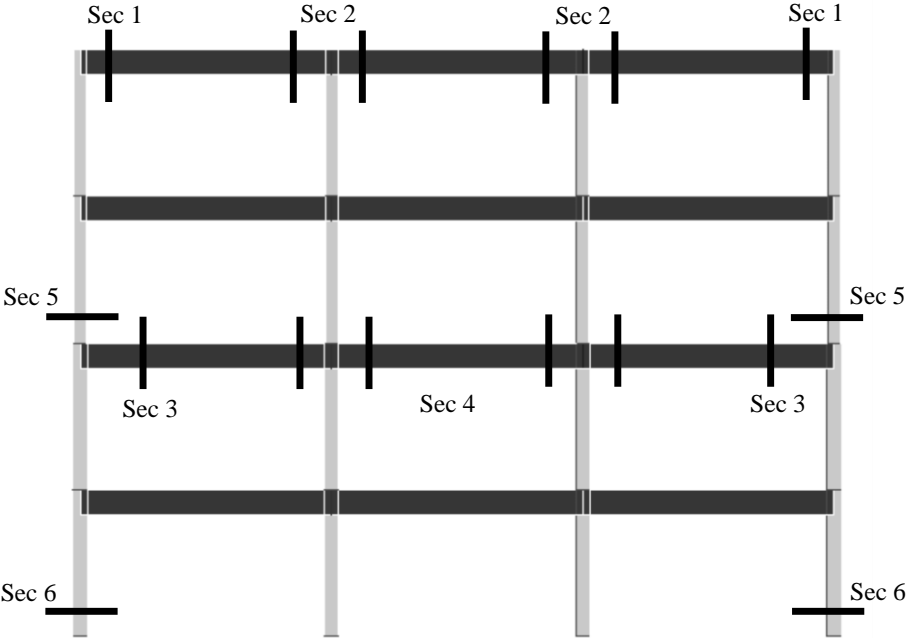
Schematic representation of the 4-storey frame structure analysed in the study with names and location of the different cross-sections characterizing the structural members
